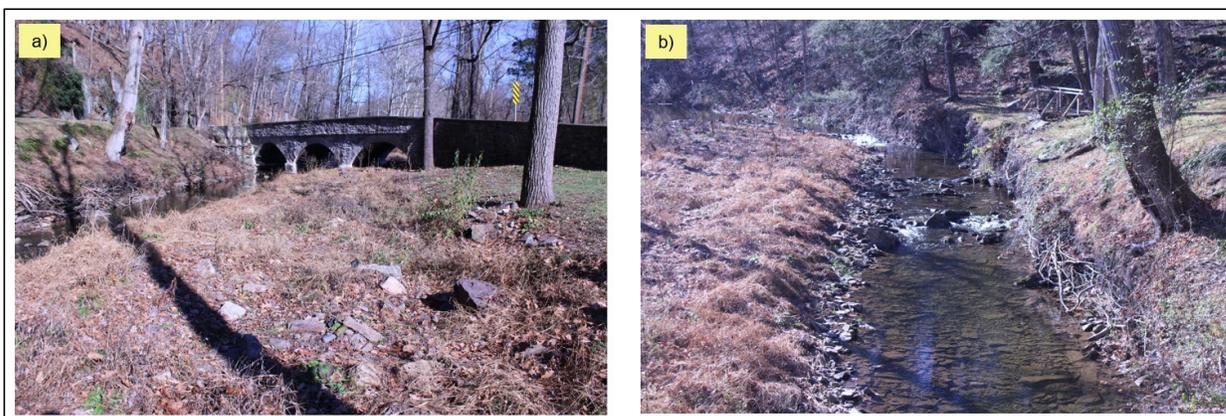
a) Triple-arch Fleecydale Road bridge with elevated road approaches blocking a portion of the floodplain may be responsible for b) deposition on the right bank (left side of photo) and erosion of the opposite bank.
